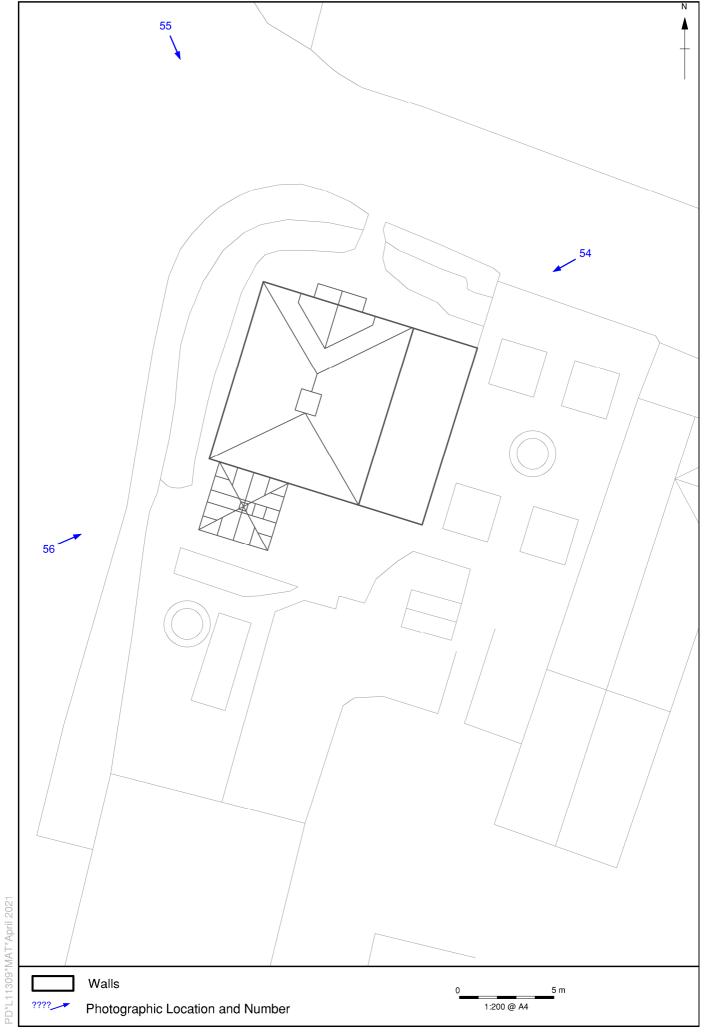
Photographic locations of Street Lane Farmhouse (Asset 22)
